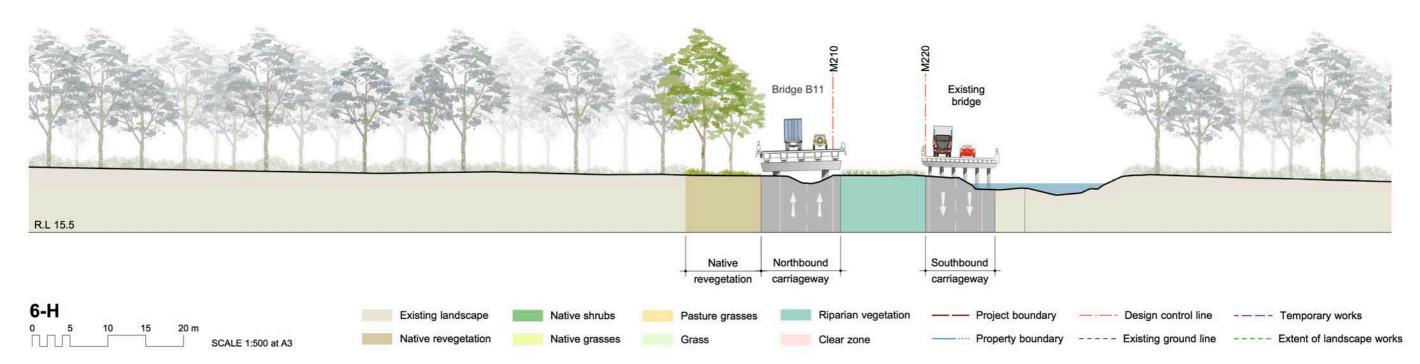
Section 6-H at Bridge B10 – Northbound bridge over Tabbimoble Overflow
